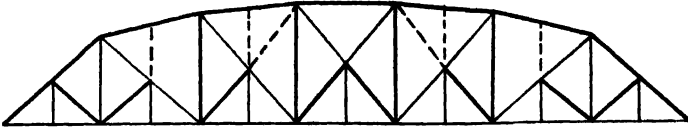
Petit Truss with Sub-struts and Polygonal Top Chord (Pennsylvania Truss).
